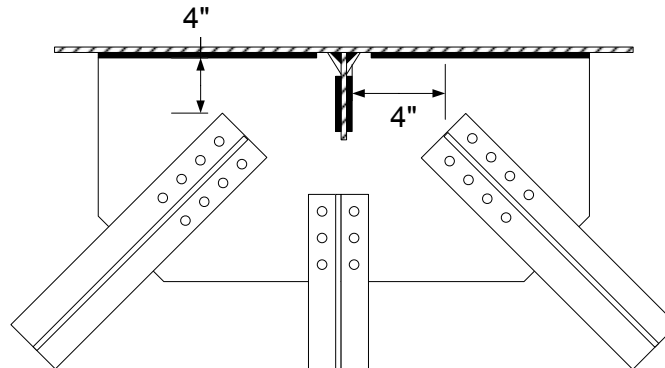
Lateral Connection Plate Welded to the Transverse Stiffener
